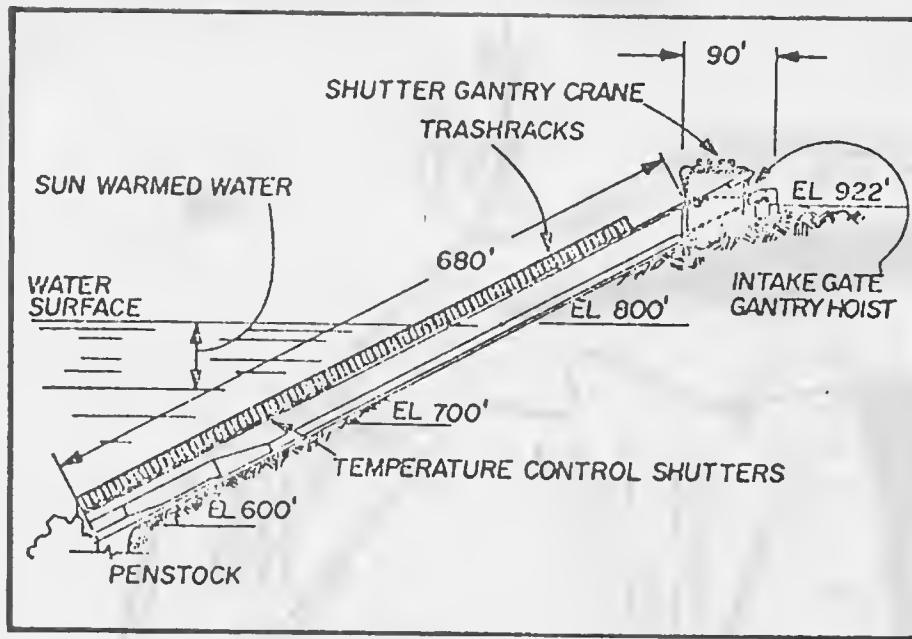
(Drawing) Schematic Cross Section of Intake System
